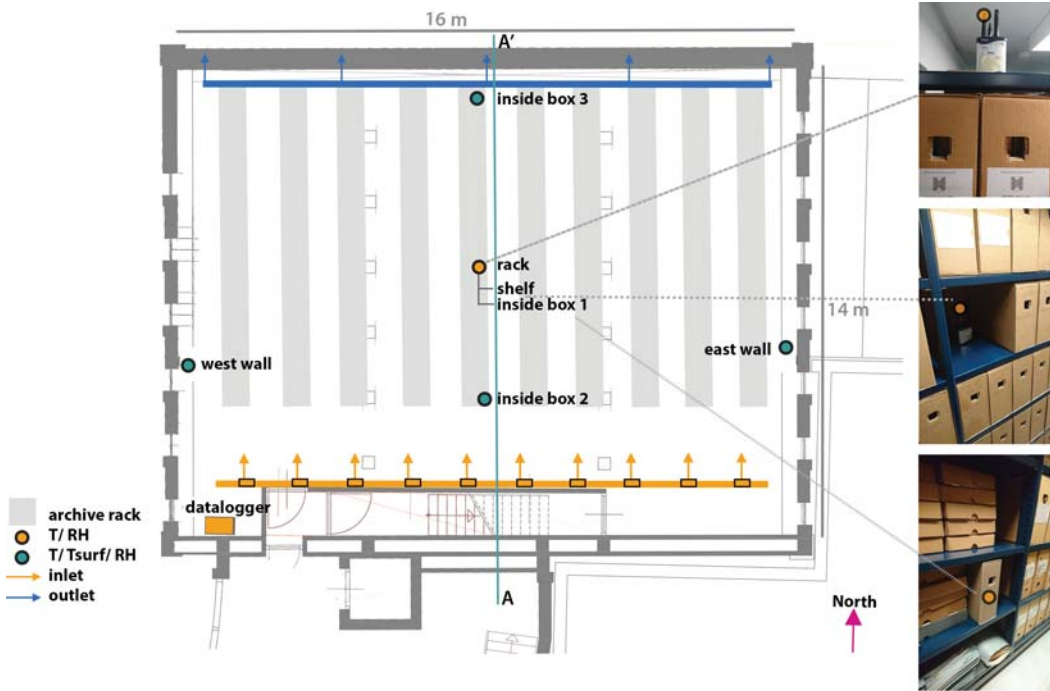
Floor plan of depot 6 with locations of experimental measurement campaign.
